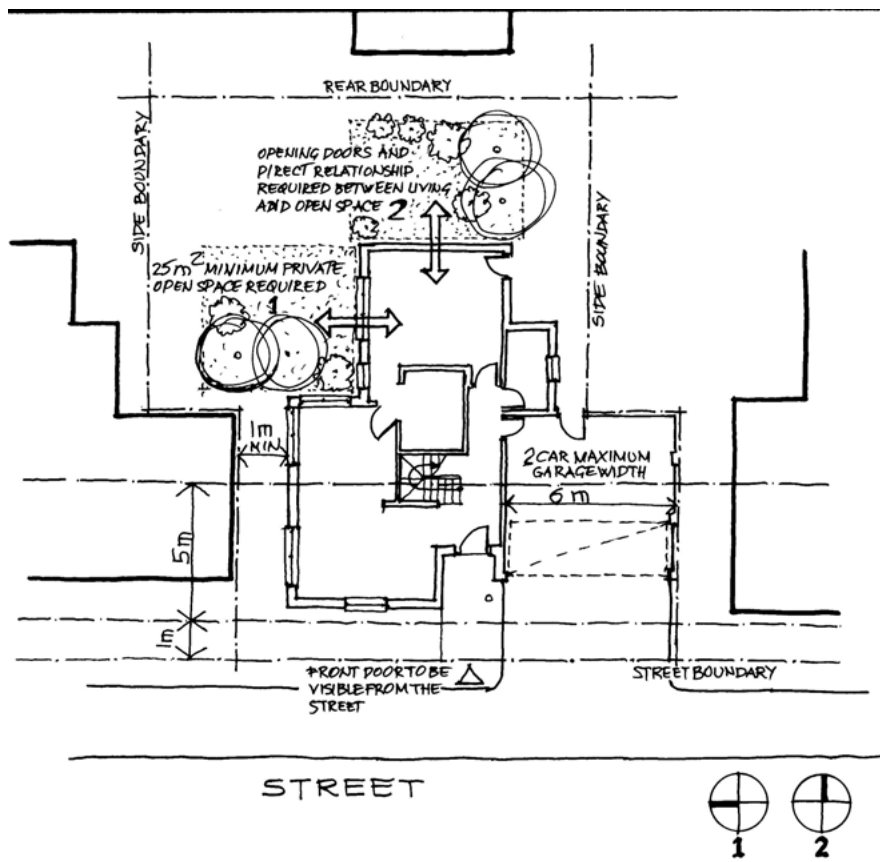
Detached family dwelling layout – zipper lot.
